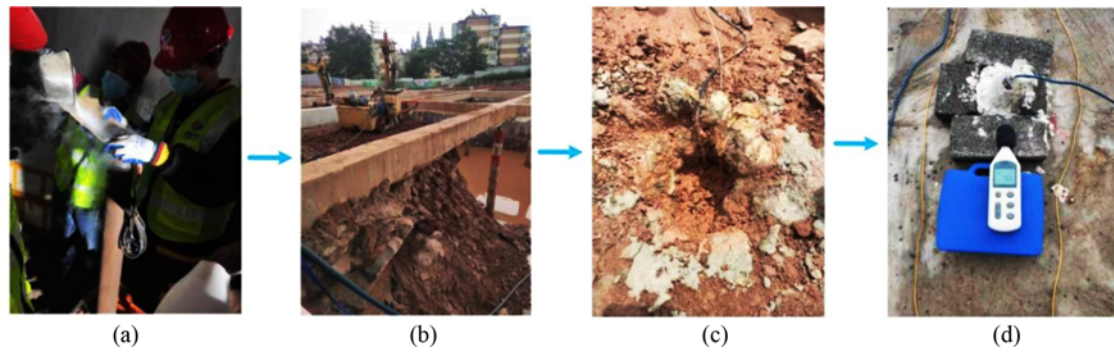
Experimental Steps Diagram: (a) Assemble the Fracturing Tube, (b) Drilling, (c) Seal the Hole, (d) Arrange the Sensors
